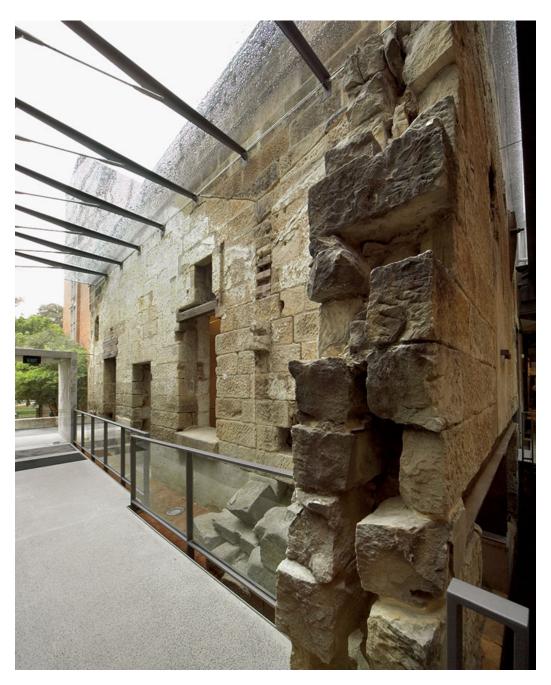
Example of heritage stone wall with glazed separation to wall and roof allowing full appreciation of heritage wall inside and out. This image also highlights one benefit of the proposed open (non-glazed) separation in that even with glazing providing a high level of openness, you still get structure, reflections and rain which reduce visibility. The Mint, Sydney, FJMT Architects, 2002 (source: John Gollings)
